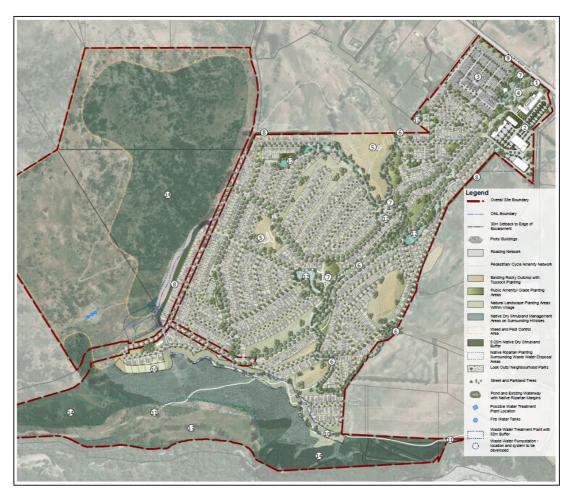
Landscape Masterplan. Source: Page 23 of Landscape Drawings (Appendix 5).
